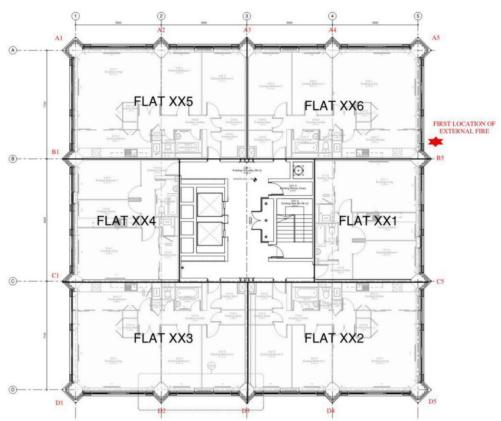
Typical floor plan of Grenfell Tower – showing relative positions of each flat (SEA00010474)
